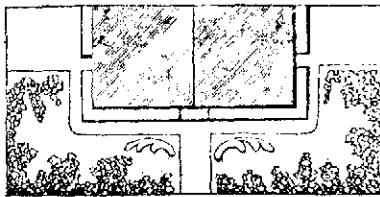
Plan for front yard of a double house and lot. From: Kern, Practical Landscape Gardening, 1855.
